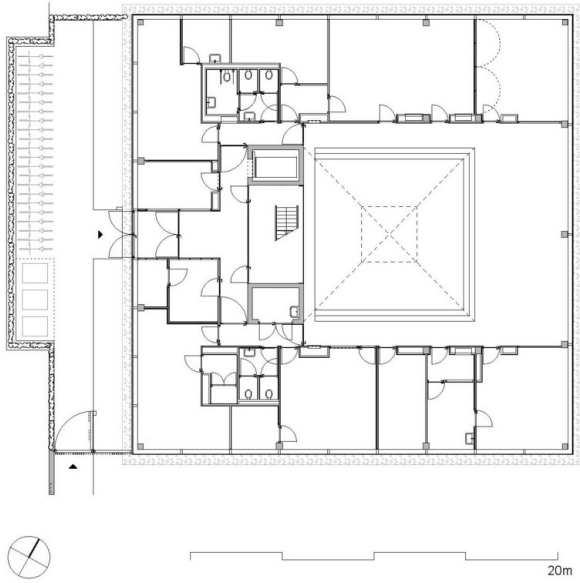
The floorplan [Archdaily, n.d.]
